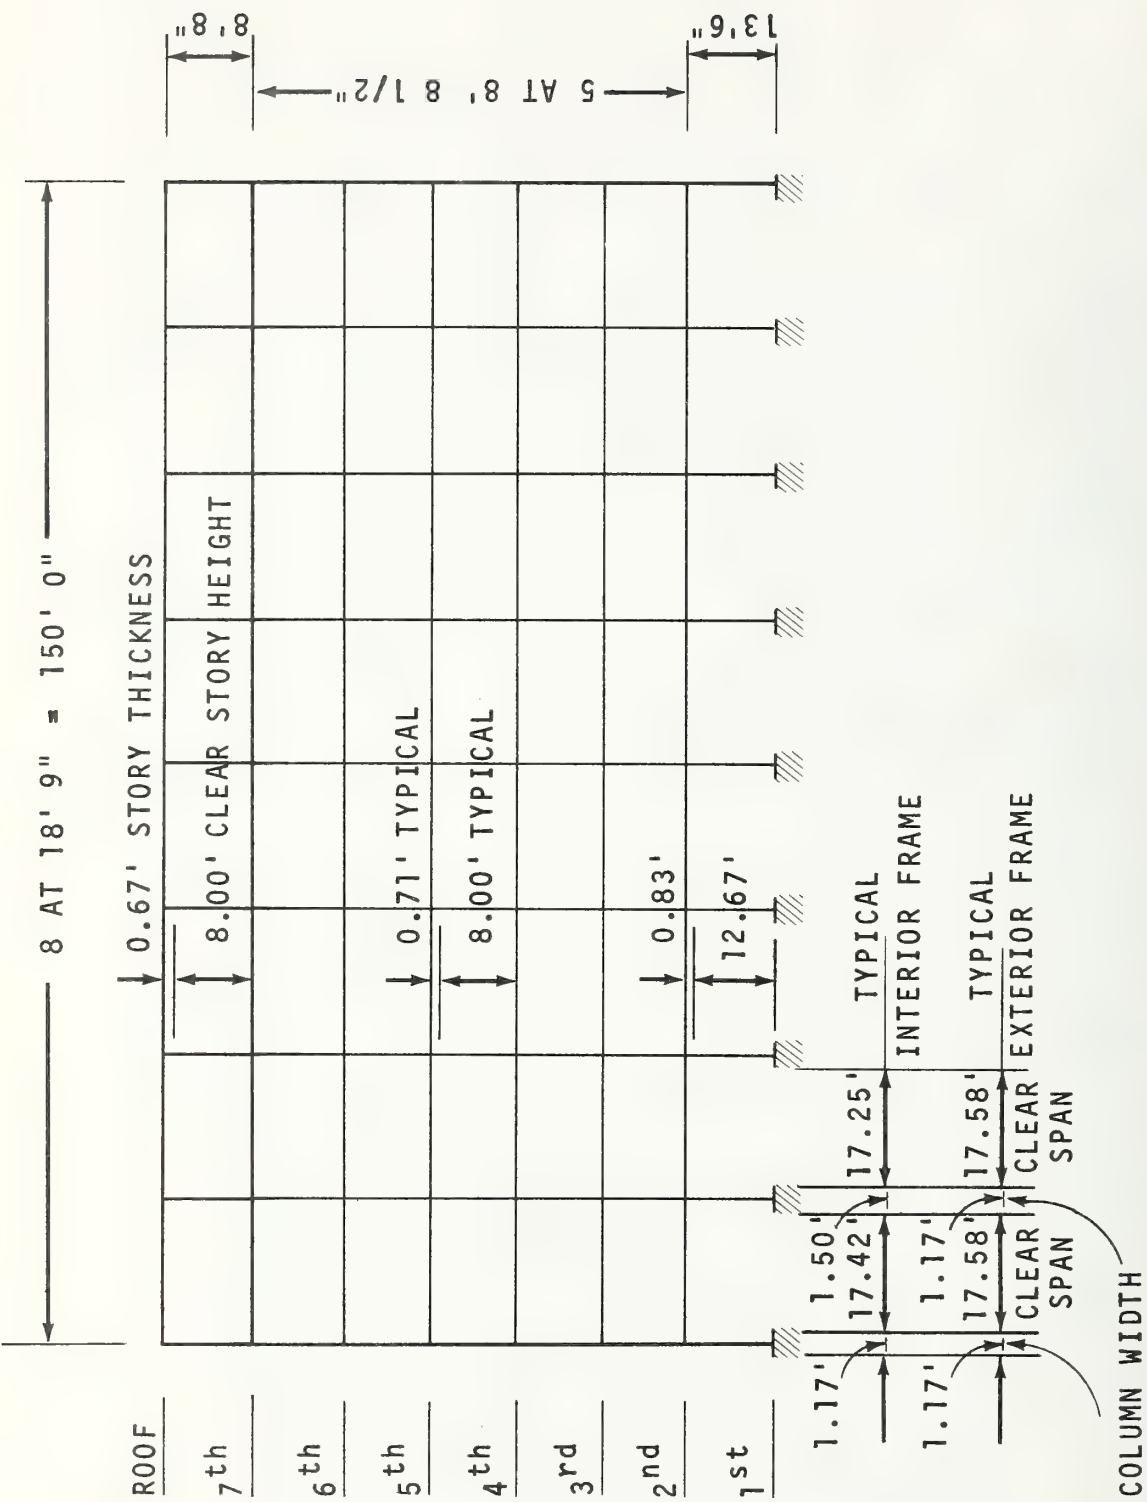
Typical Longitudinal Frame -- Building No. 29
